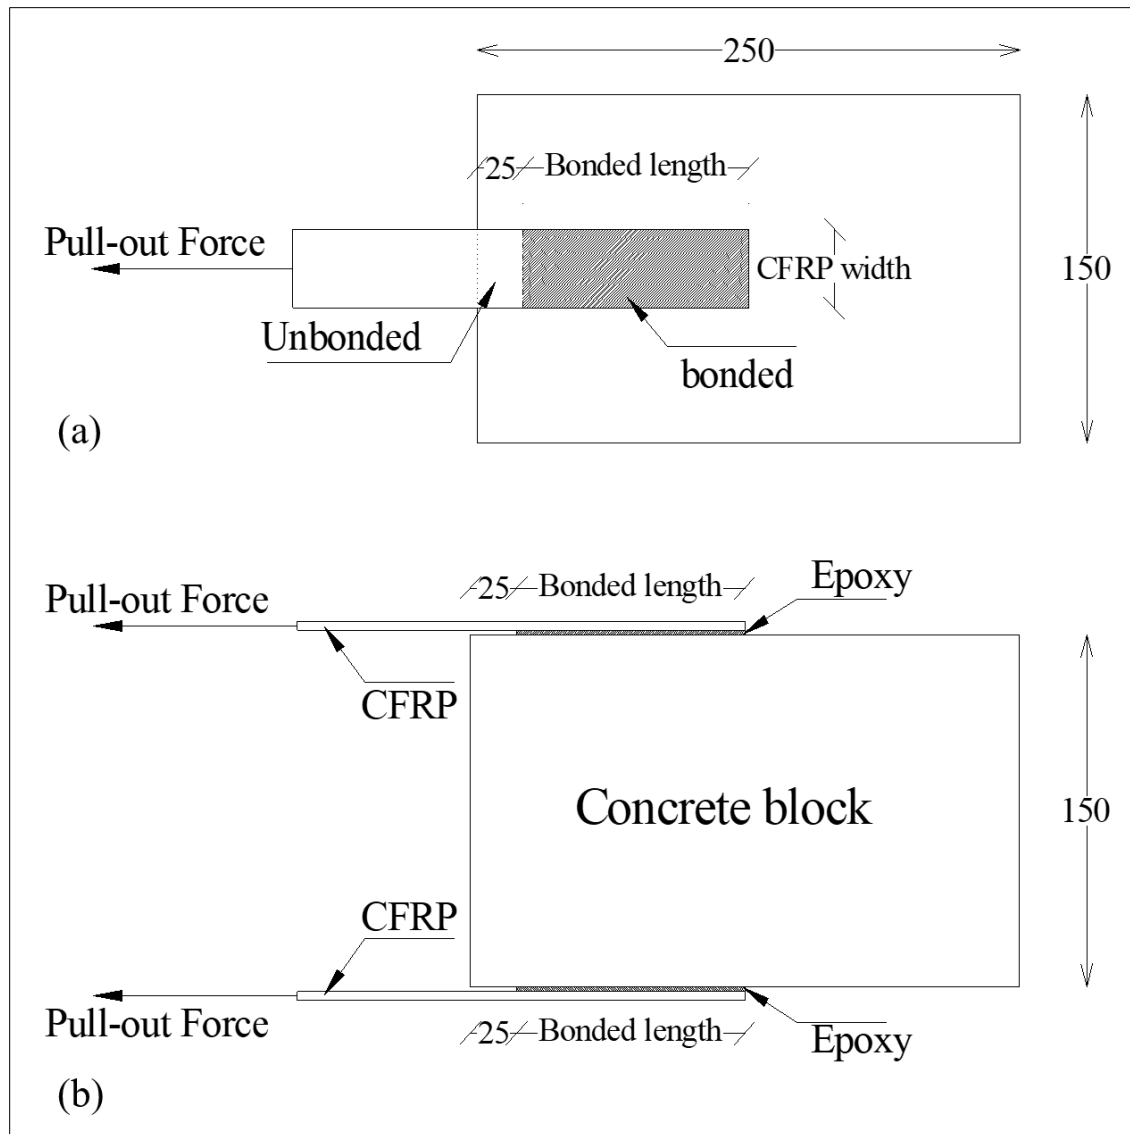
Schematic of double-lap pull-out test set-up (dimensions in mm): a) top view; b) side view
